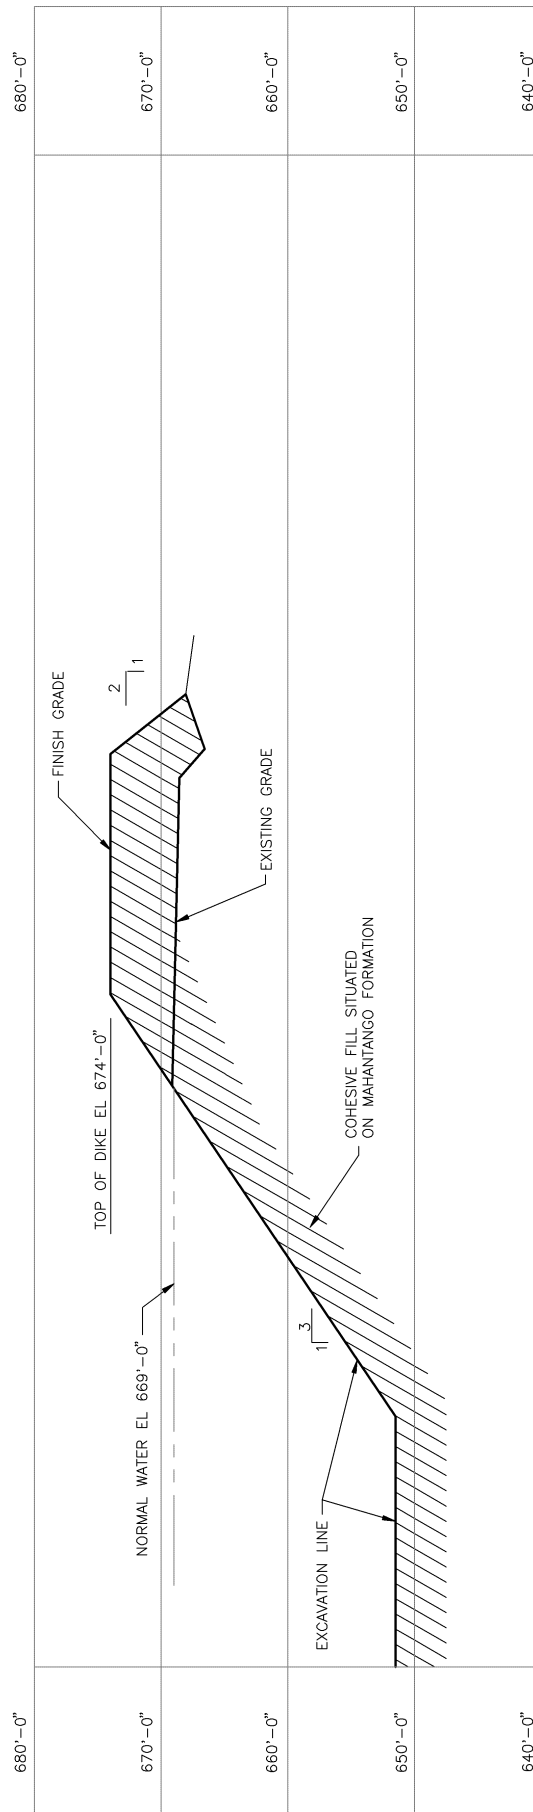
{Plant Arrangement - ESWEMS Retention Pond Section at Embankment}
